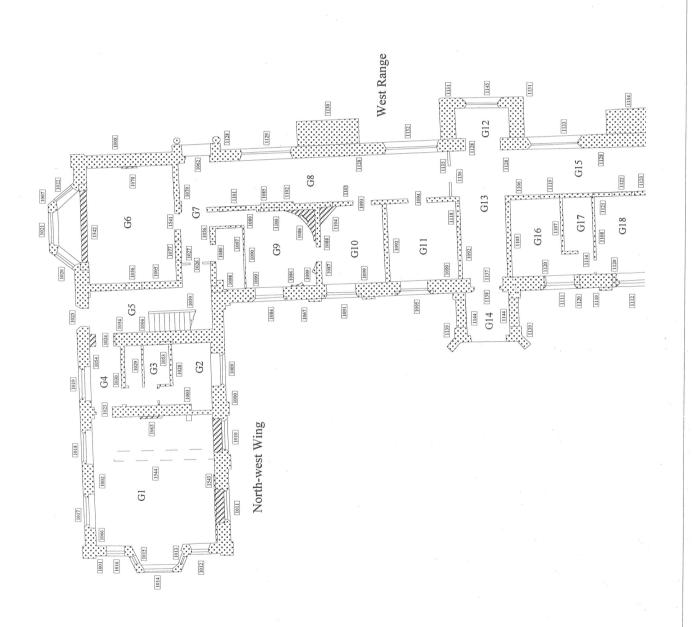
Ground Floor Plan - North (North West Wing and West Range)
